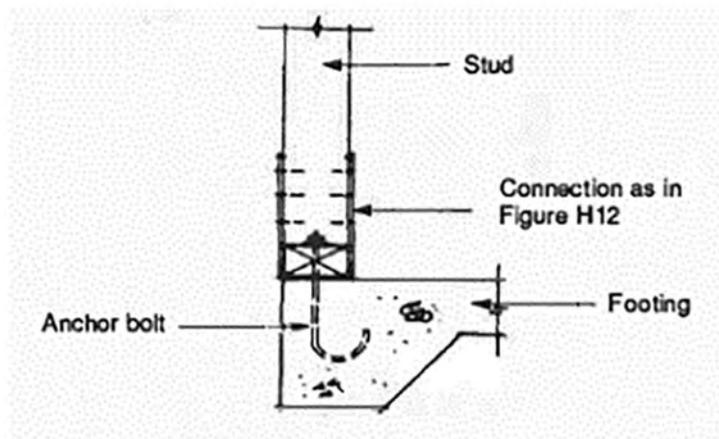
FIXING BOTTOM PLATE TO FOOTING
